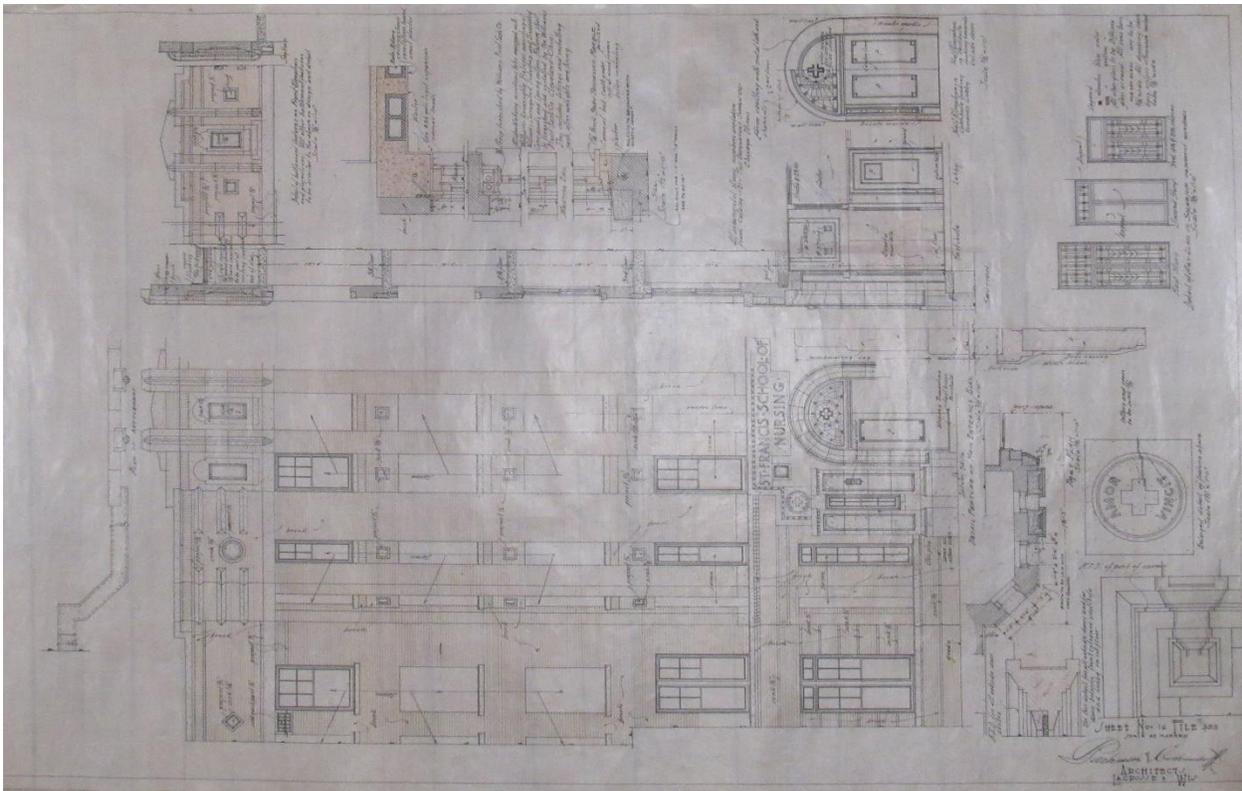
Original construction documents. “Facade Details” Sheet 16. 1 April 1941.
